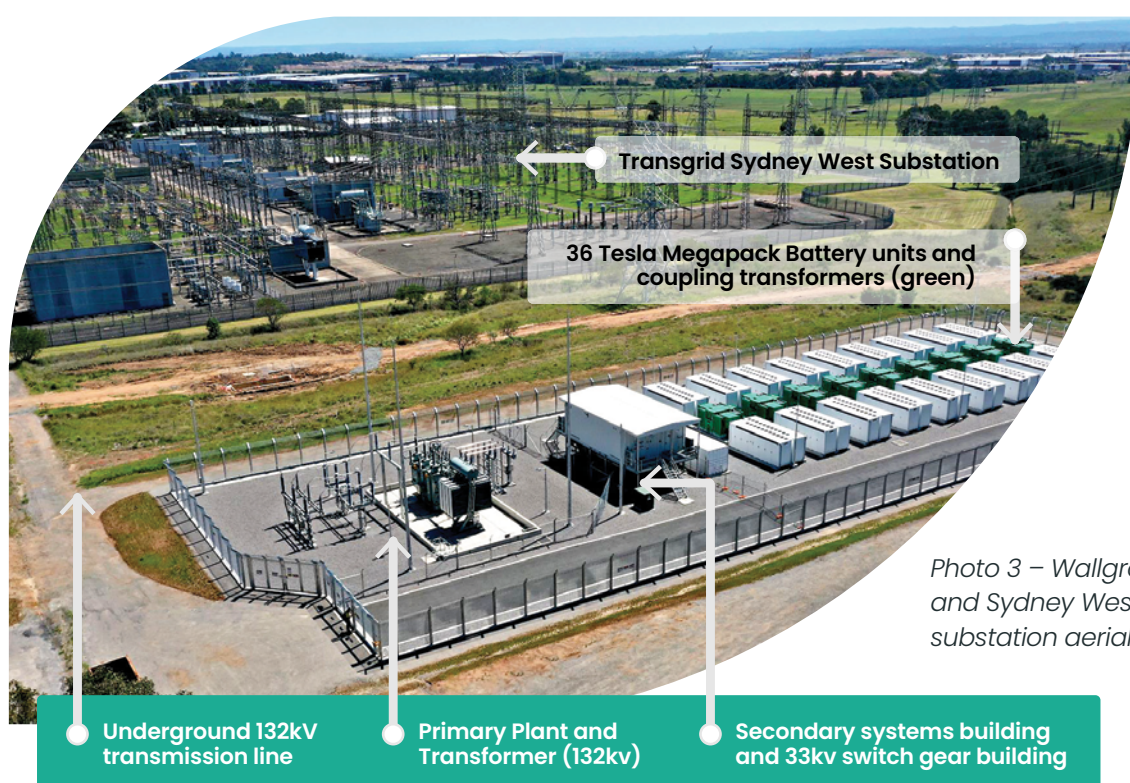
Wallgrove Grid battery and Sydney West 330/132kV substation aerial view
